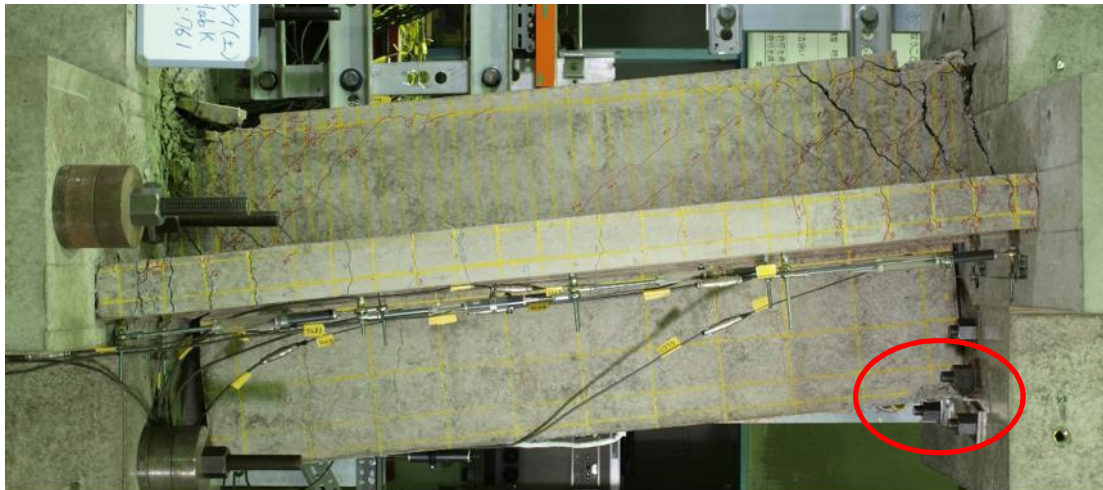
Touching between the non-structural wall and one of the supports with crushing of concrete at ends of the beam
